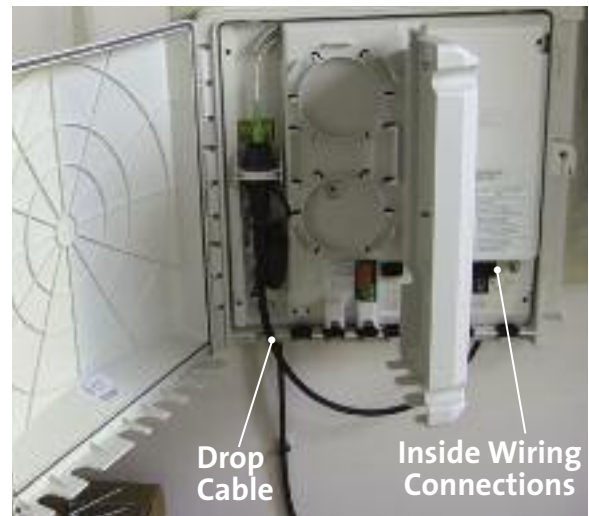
Wall-Mounted ONT Showing Connections | Photo NS115
